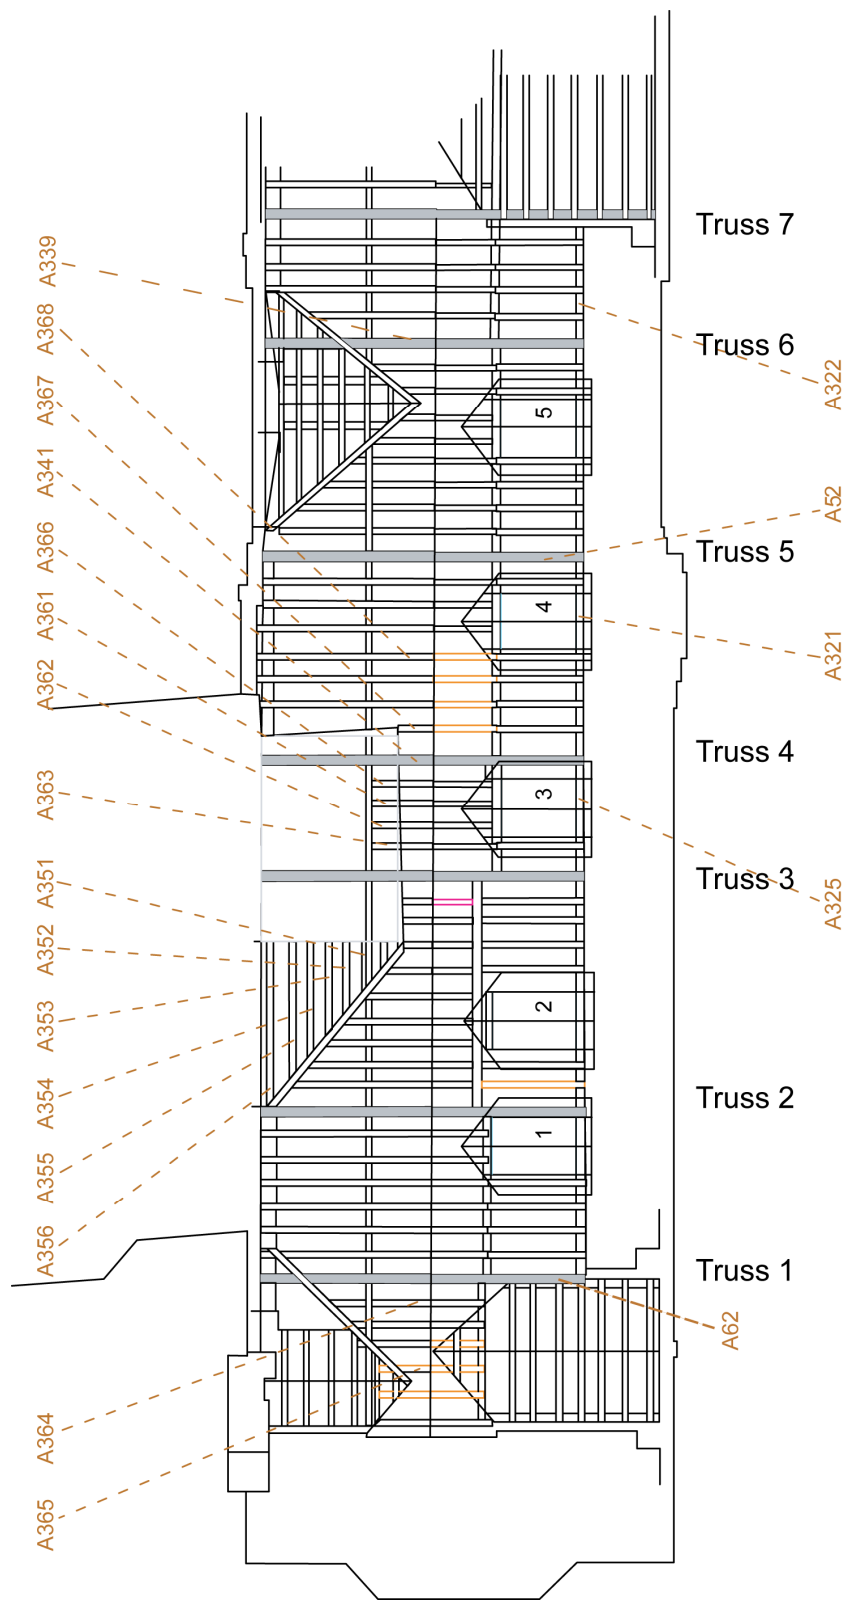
Roof plan of the East range, showing the locations of samples APT-A52, A62, A321–2, A325, A339, A341, A351–6, and A361–8
